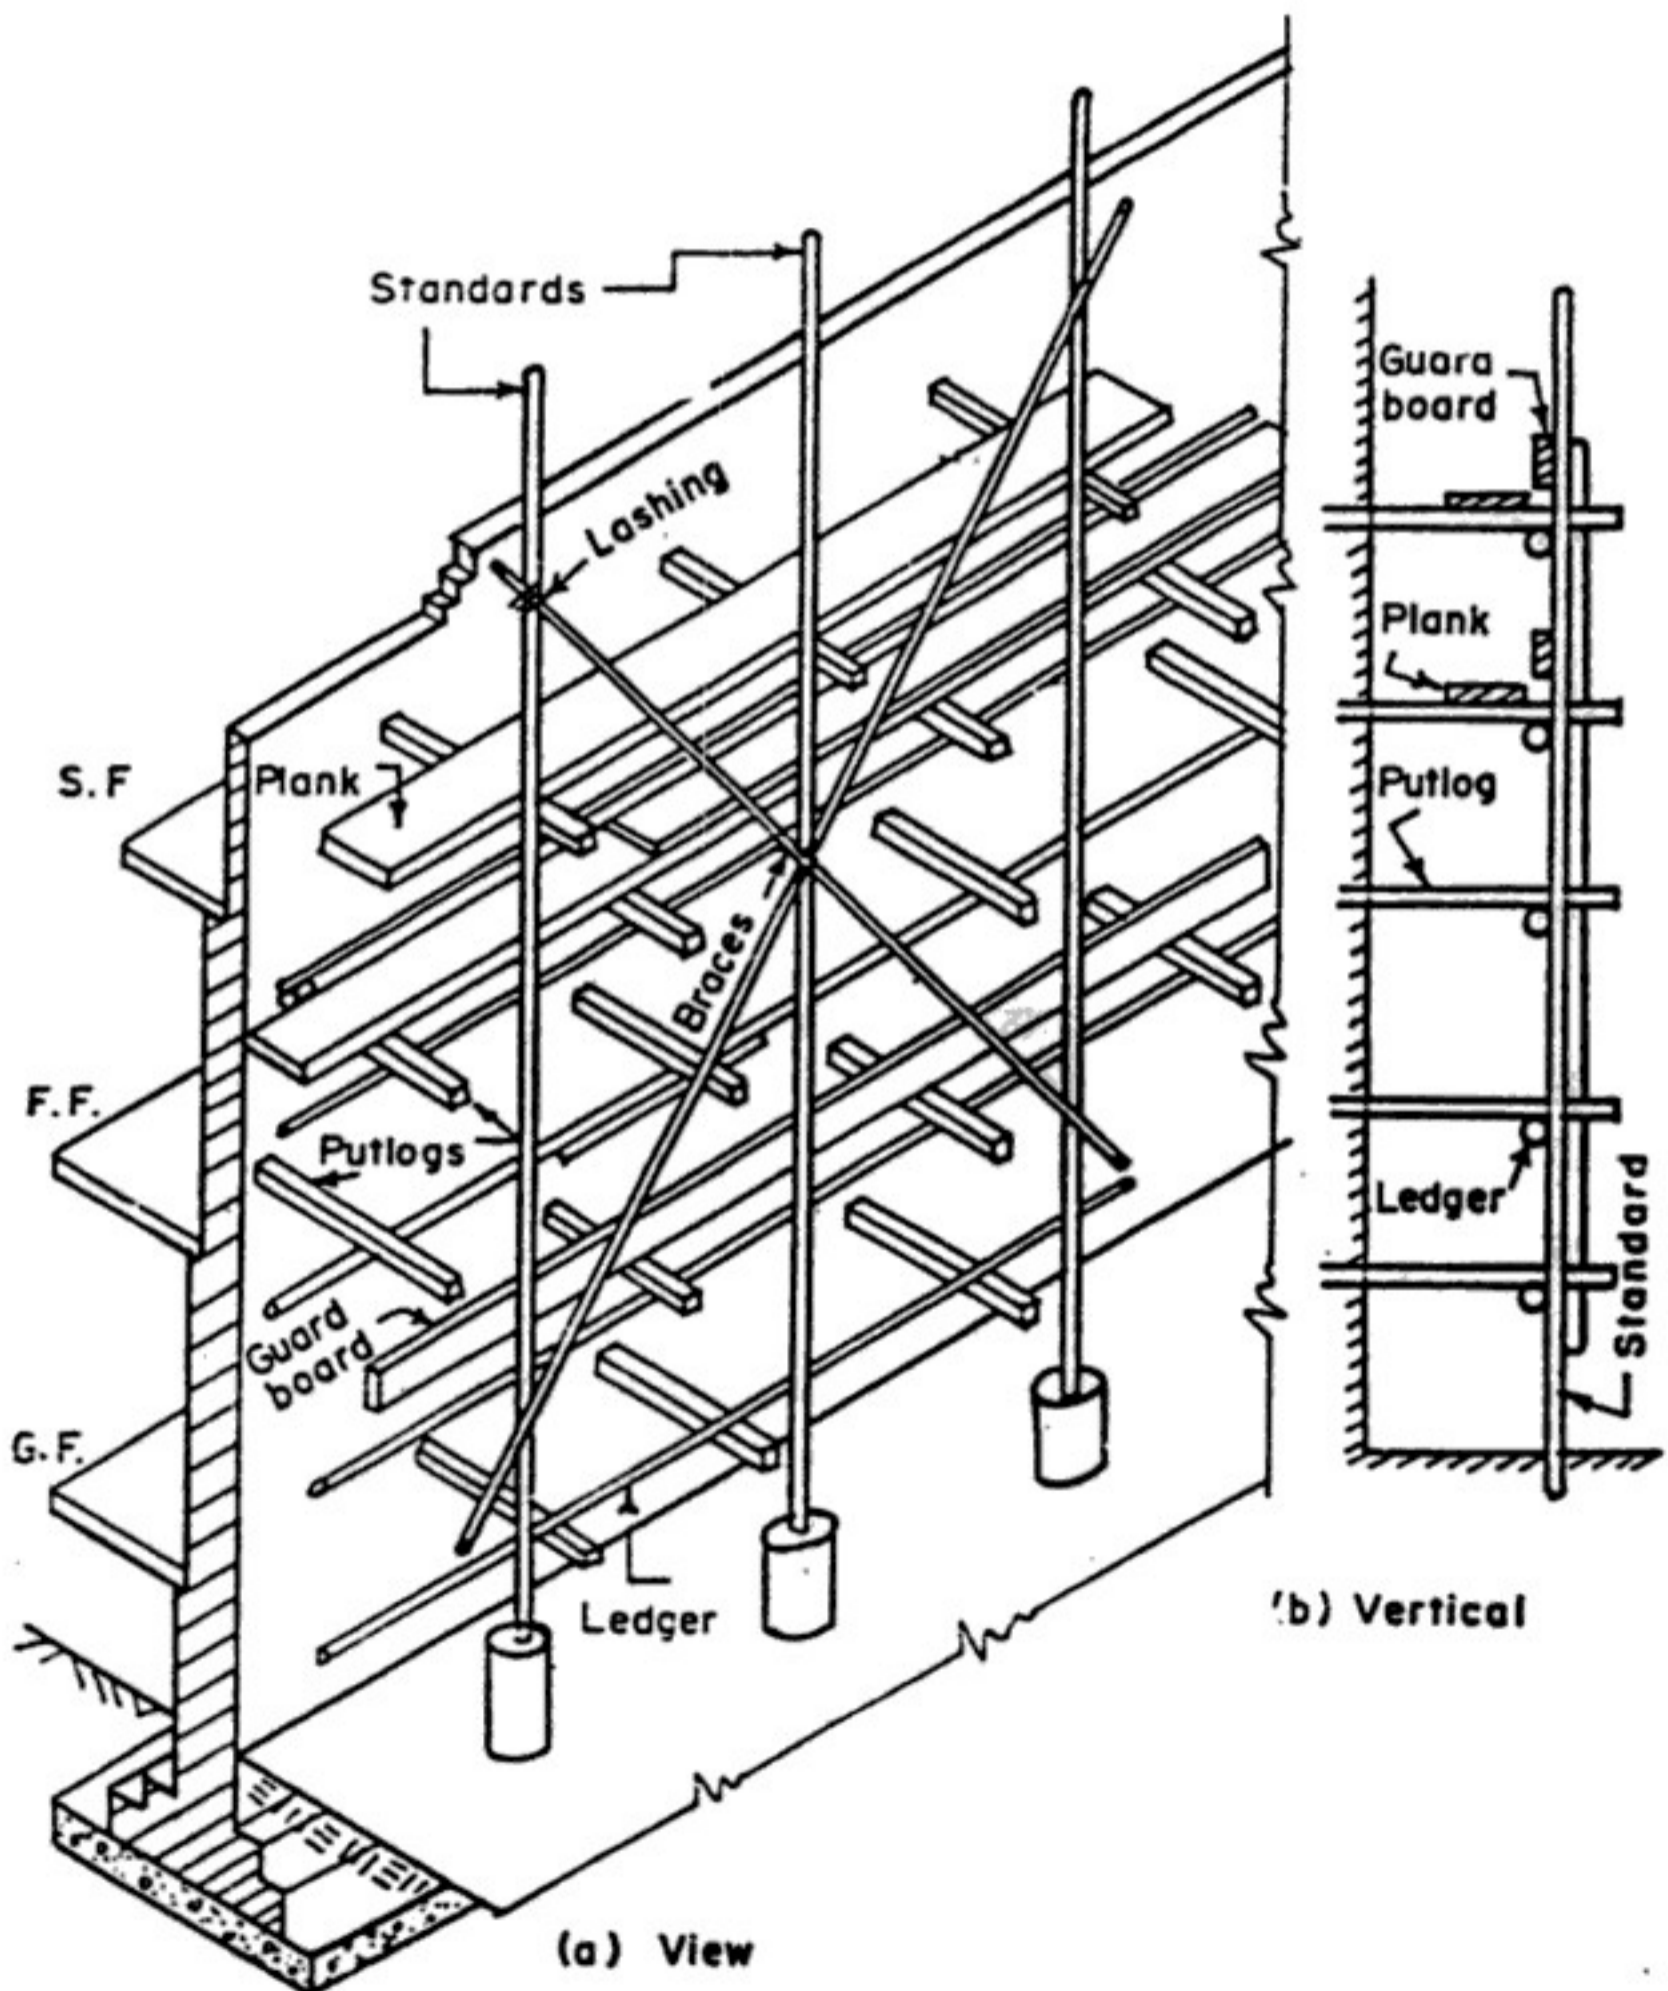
BRICK LAYERS SCAFFOLDING.
